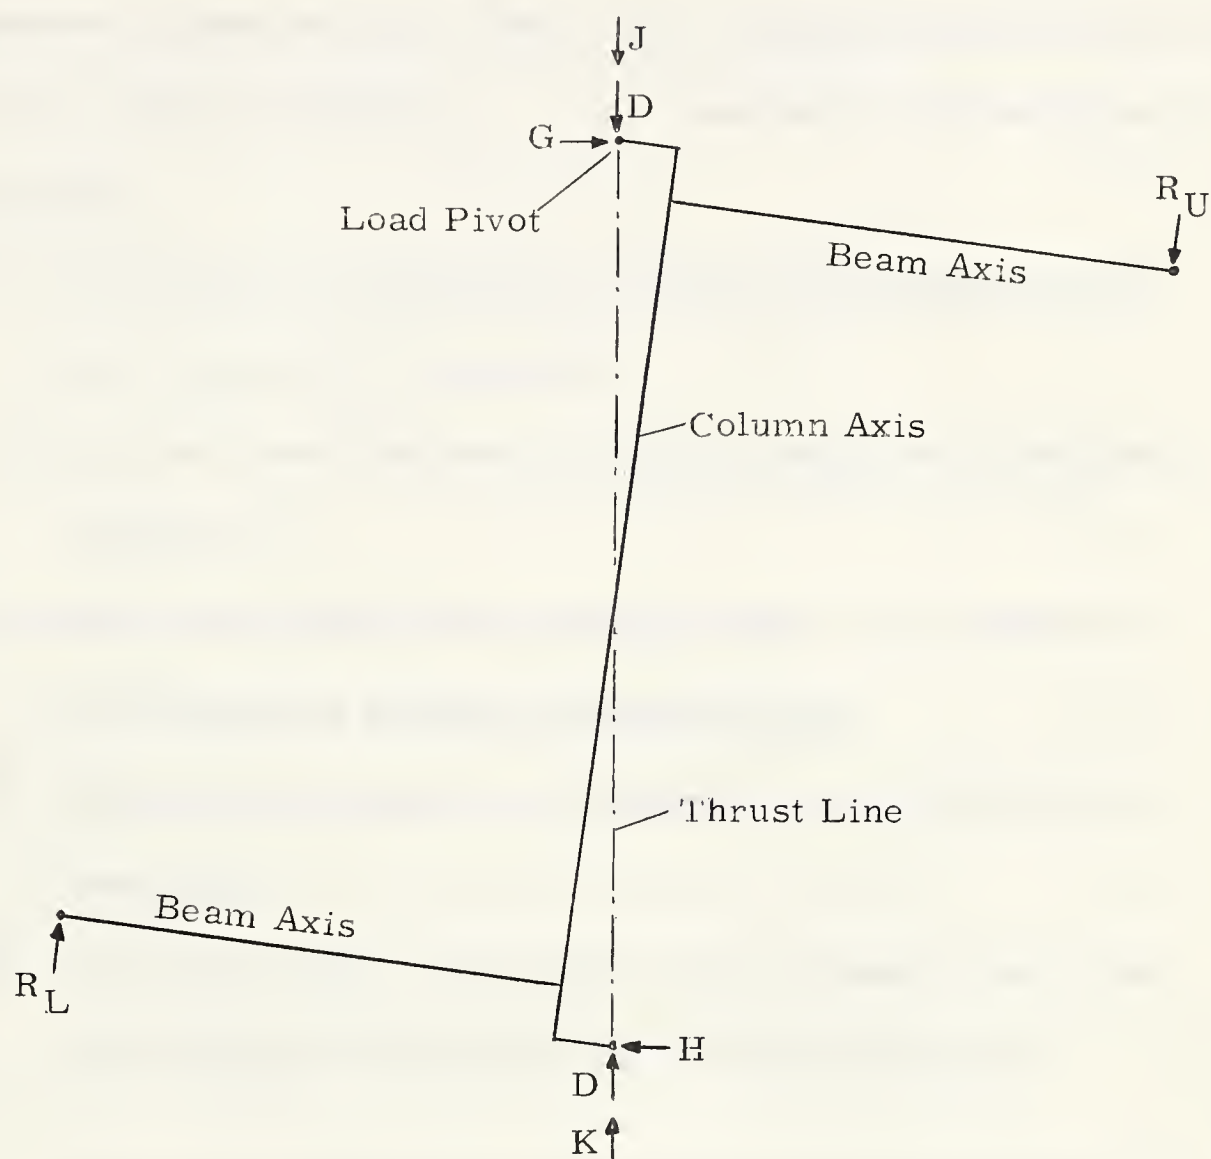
EXTERNAL FORCES ON RESTRAINED COLUMN SPECIMEN
